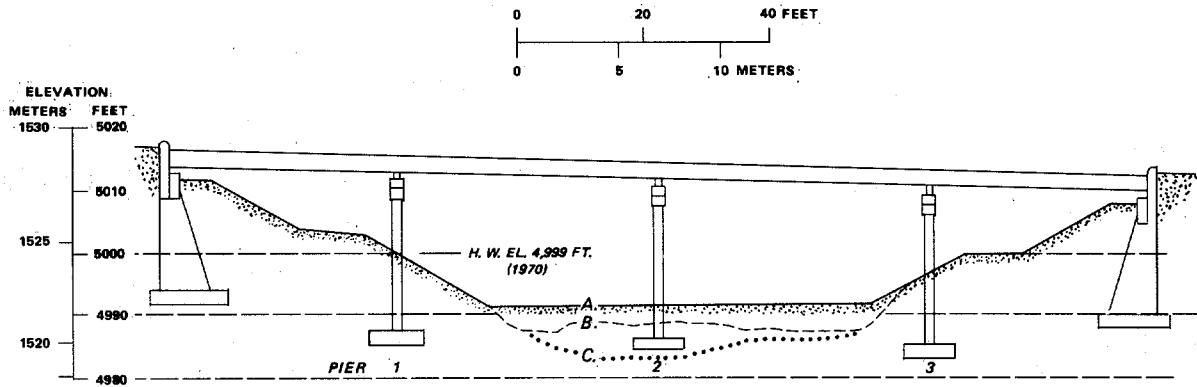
Elevation sketch of I-25 bridge at Box Elder Creek. A, channel bed as excavated at time of bridge construction; B, bed after flood, as surveyed in 1970; C, top of unscoured gravel, as determined by Wyoming State Highway Department.
